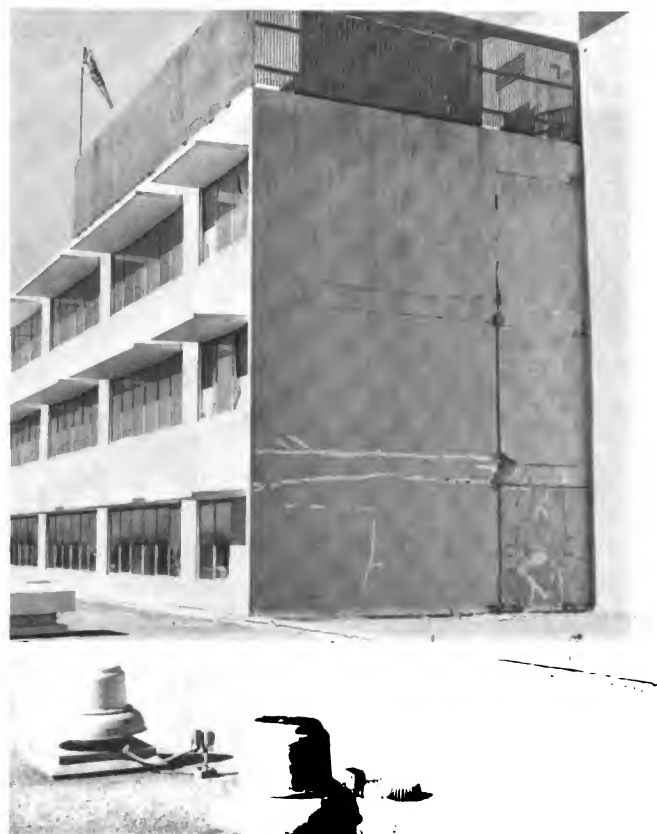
Pacoima Memorial Lutheran Hospital. Elevation of shear wall on line 11. Patching of concrete prior to earthquake is visible. Note knockout panels at right side of wall. Paul Fratessa photograph.
